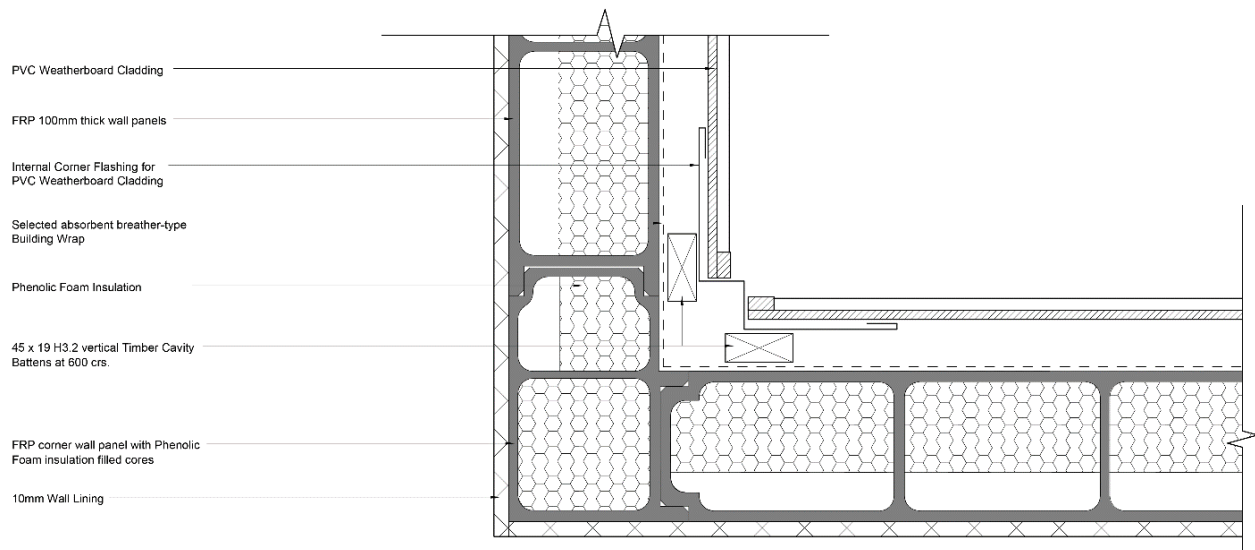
FRP wall panel system-internal corner filled with phenolic foam insulation
